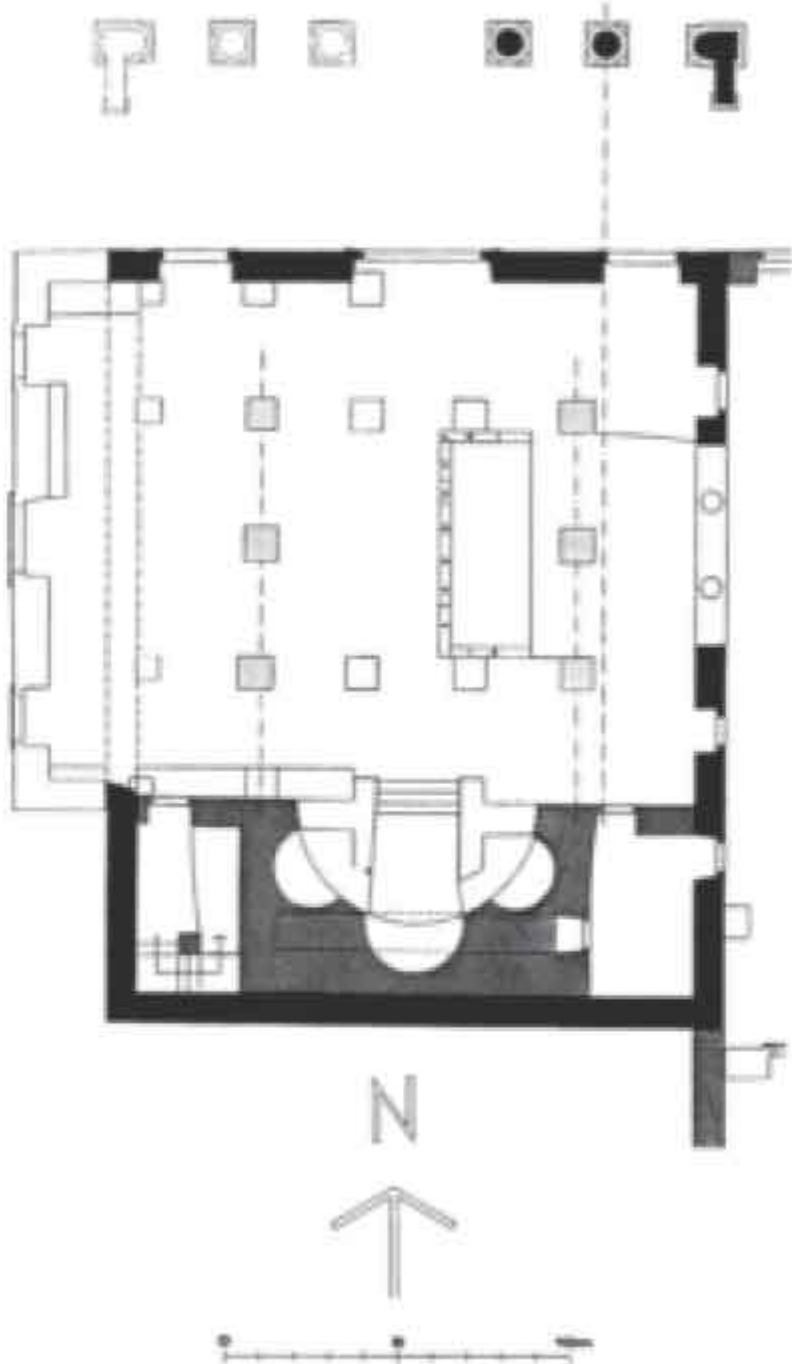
Kanatha, 'Serail', 'western temple', groundplan, reconstruction (surveyed and drawn by Ch. Ertel).
